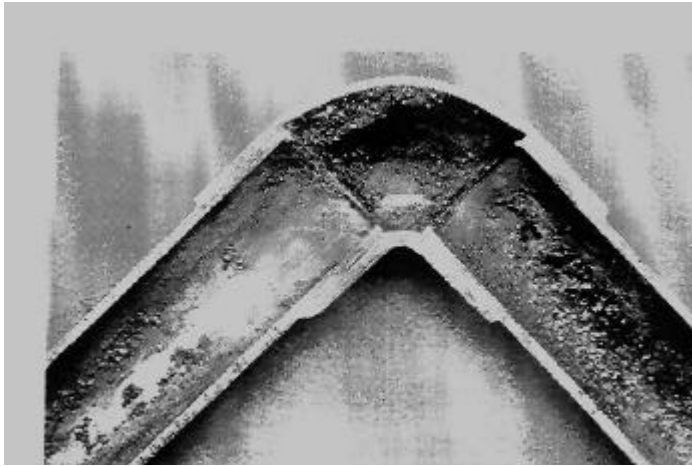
Copper tube showing workmanship defect, i.e., unreamed tube ends, solder globs, and excess solder flux.
